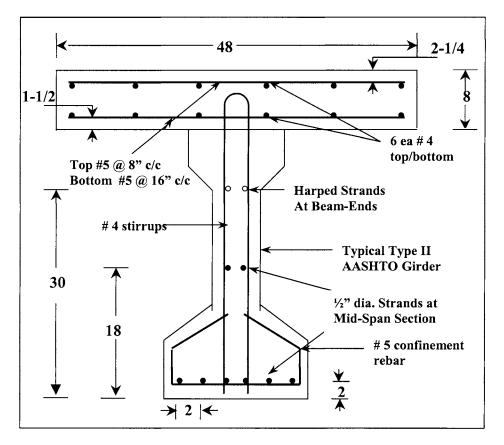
Prestressed Composite Test Girders Cross-Section (all dimensions in inches)
